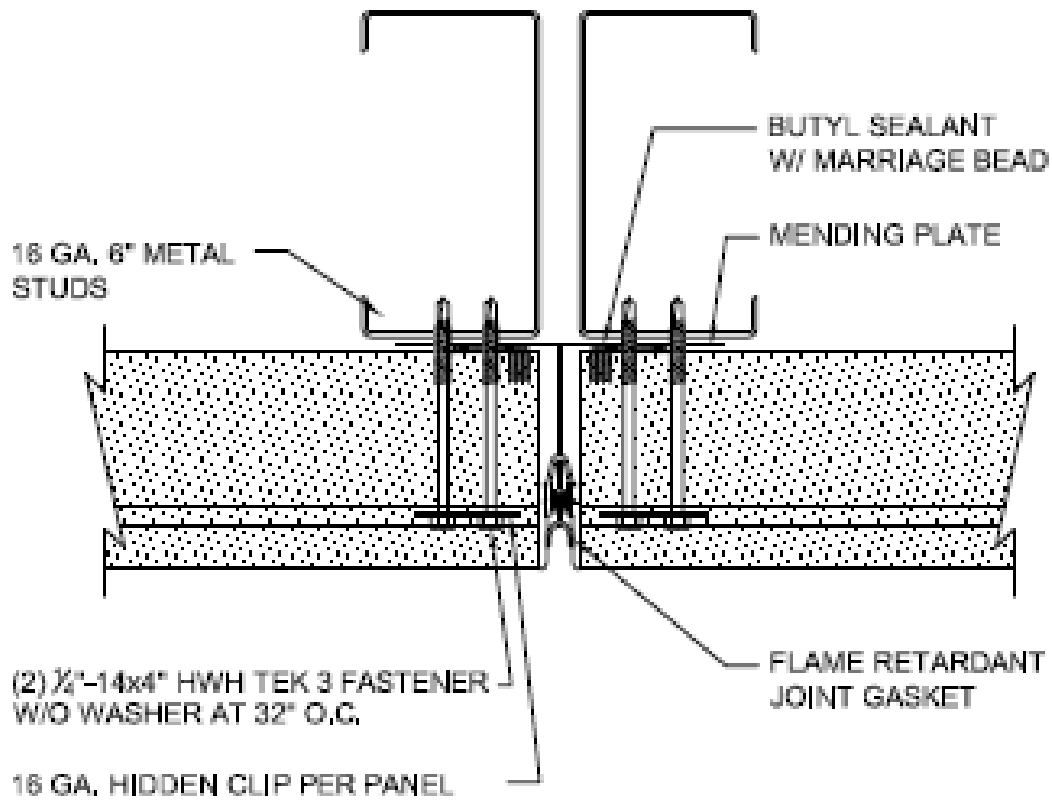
DESIGNWALL 2000 and DESIGNWALL 4000 Vertical Butt Joint Detail
